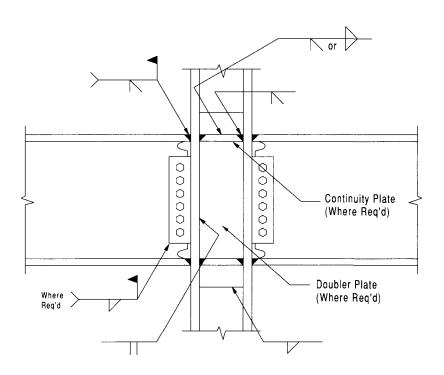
Prescribed Welded Beam-to-Column Moment Connection (Pre-Northridge)
